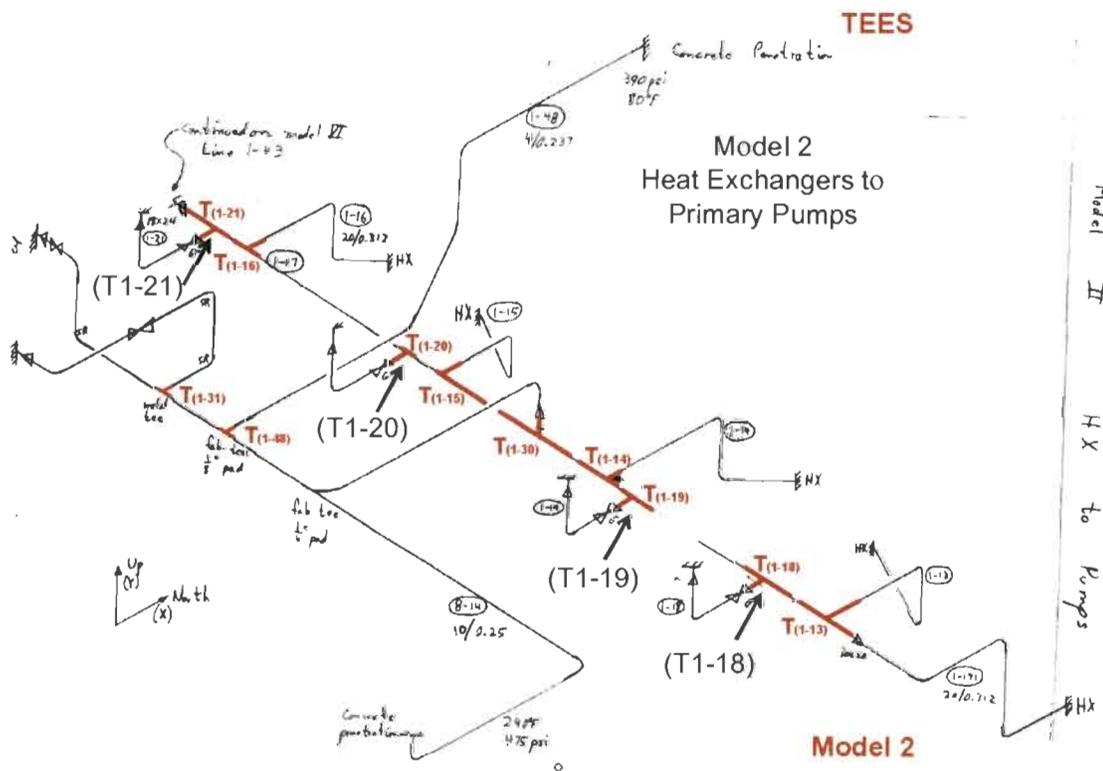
Piping Model 2, showing 30-in x 24-in reinforced tees locations.
